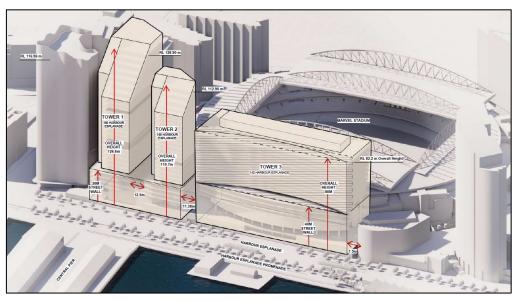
Detailed building envelope diagrams showing proposed street wall and overall building height (source: Applicant's Development Envelope Drawings associated with the Master Plan)
